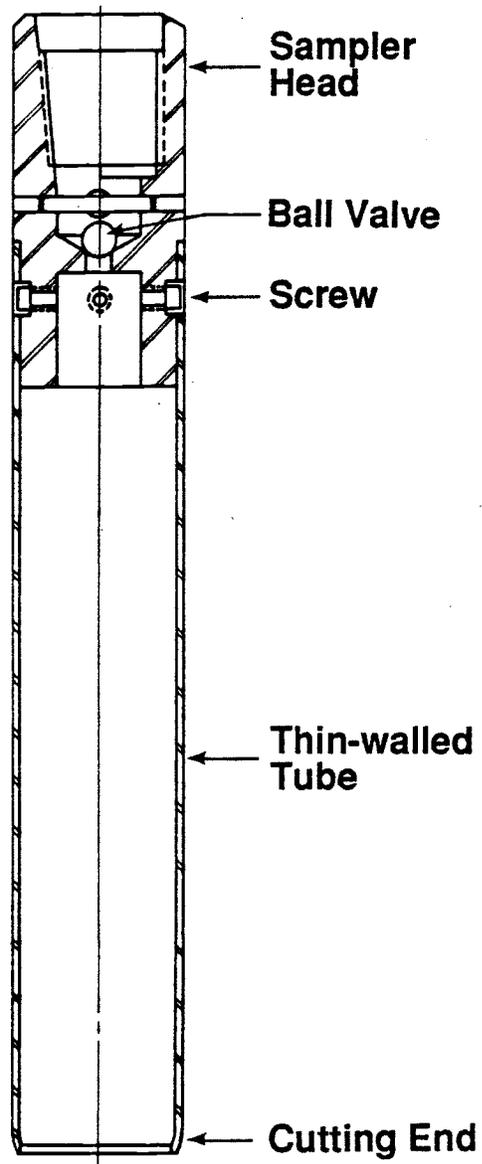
Thin-walled tube sampler (after Mobile Drill Co., Inc.)
